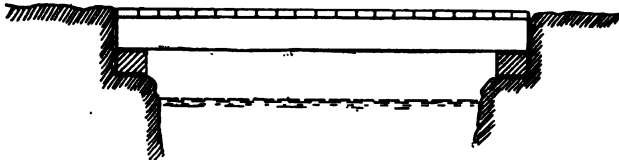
Bridge of planks laid joistwise, and covered with cross-pieces.
